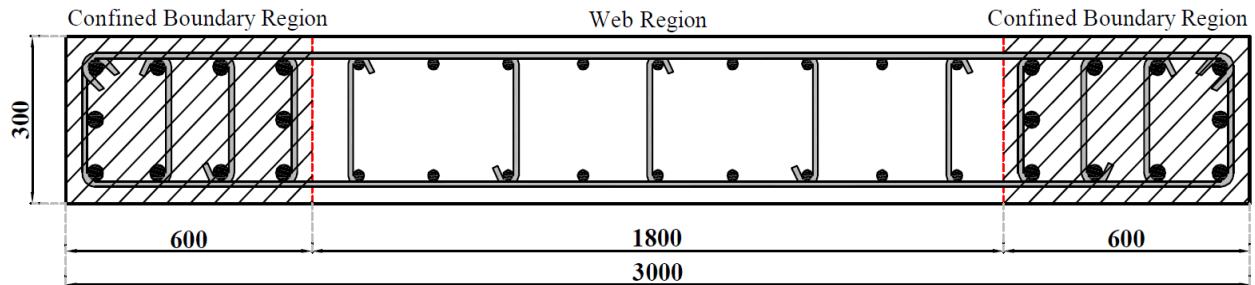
The sectional geometry and reinforcement appearance of RC shear walls
